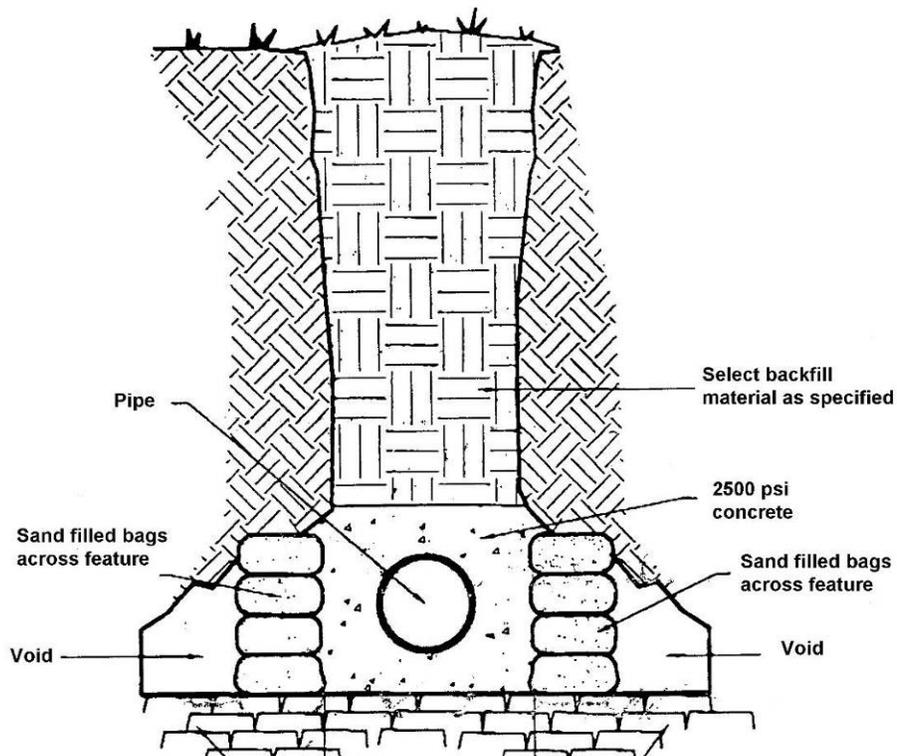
Example of Filled Void in Trench Excavation (courtesy Donald Bayes)
